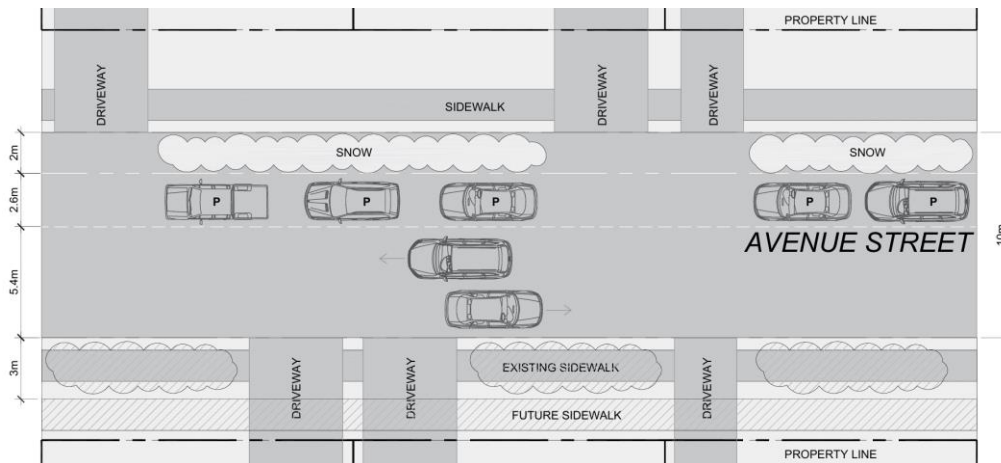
Street permit parking on one side of a 10m wide street with two sidewalks, not recommended at this time, but only after new sidewalks are constructed.
